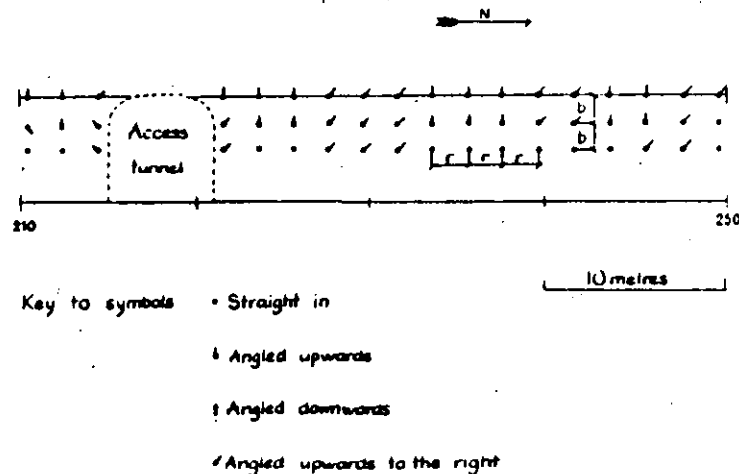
Rockbolt reinforcement drawing, showing left hand side of tunnel looking northwards. (The same rockbolt location and direction symbols are painted at the tunnel wall).
